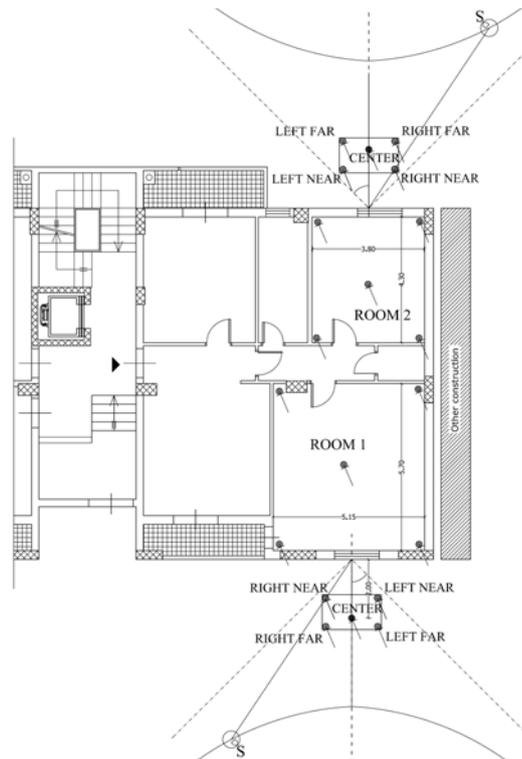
Plan of the building with points of measurement inside and outside the rooms.
